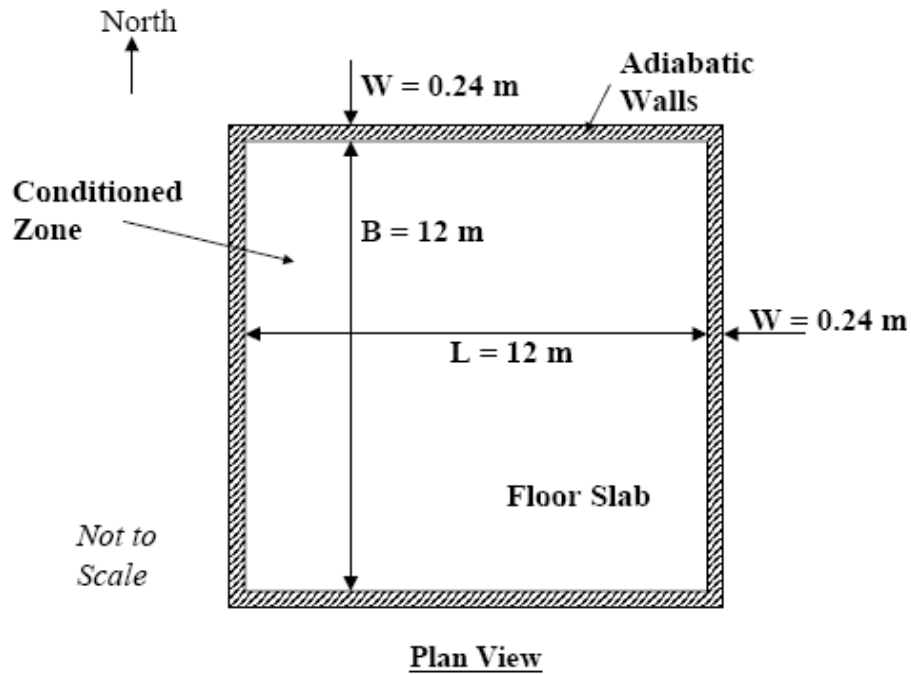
Schematic Diagram of Floor Slab and Conditioned Zone Adiabatic Wall Dimensions (Excerpted from Neymark and Judkoff 2008)
